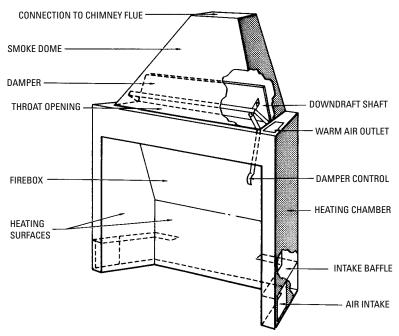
Prefabricated firebox used in the construction of a modified fireplace.
